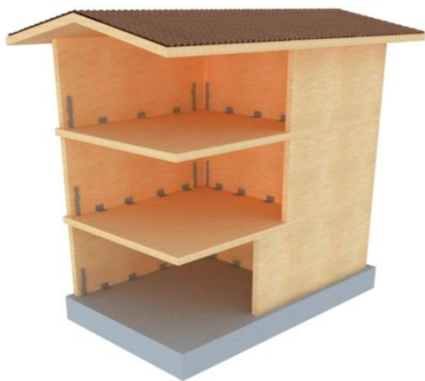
Example of CLT structure assembled using traditional connections (connectors are not drawn to scale)
